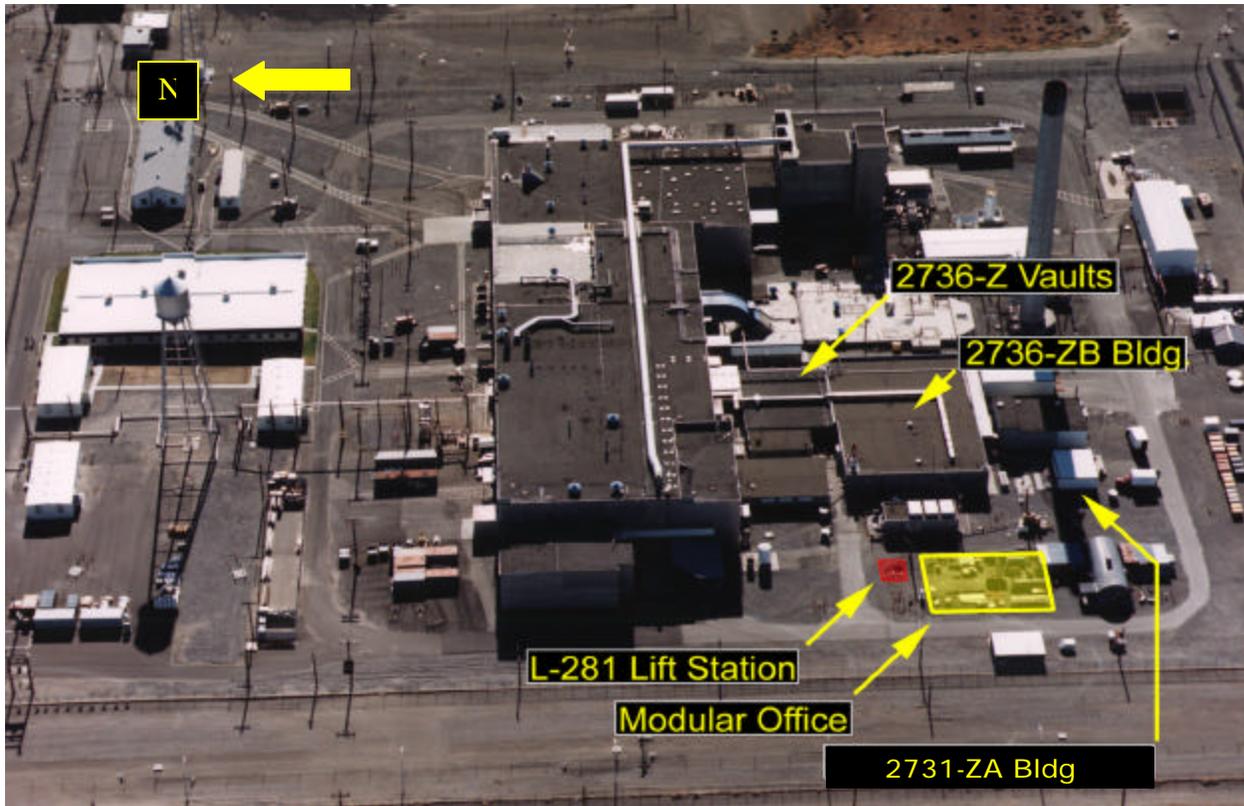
2736-ZB BUILDING, 2731-ZA BUILDING
